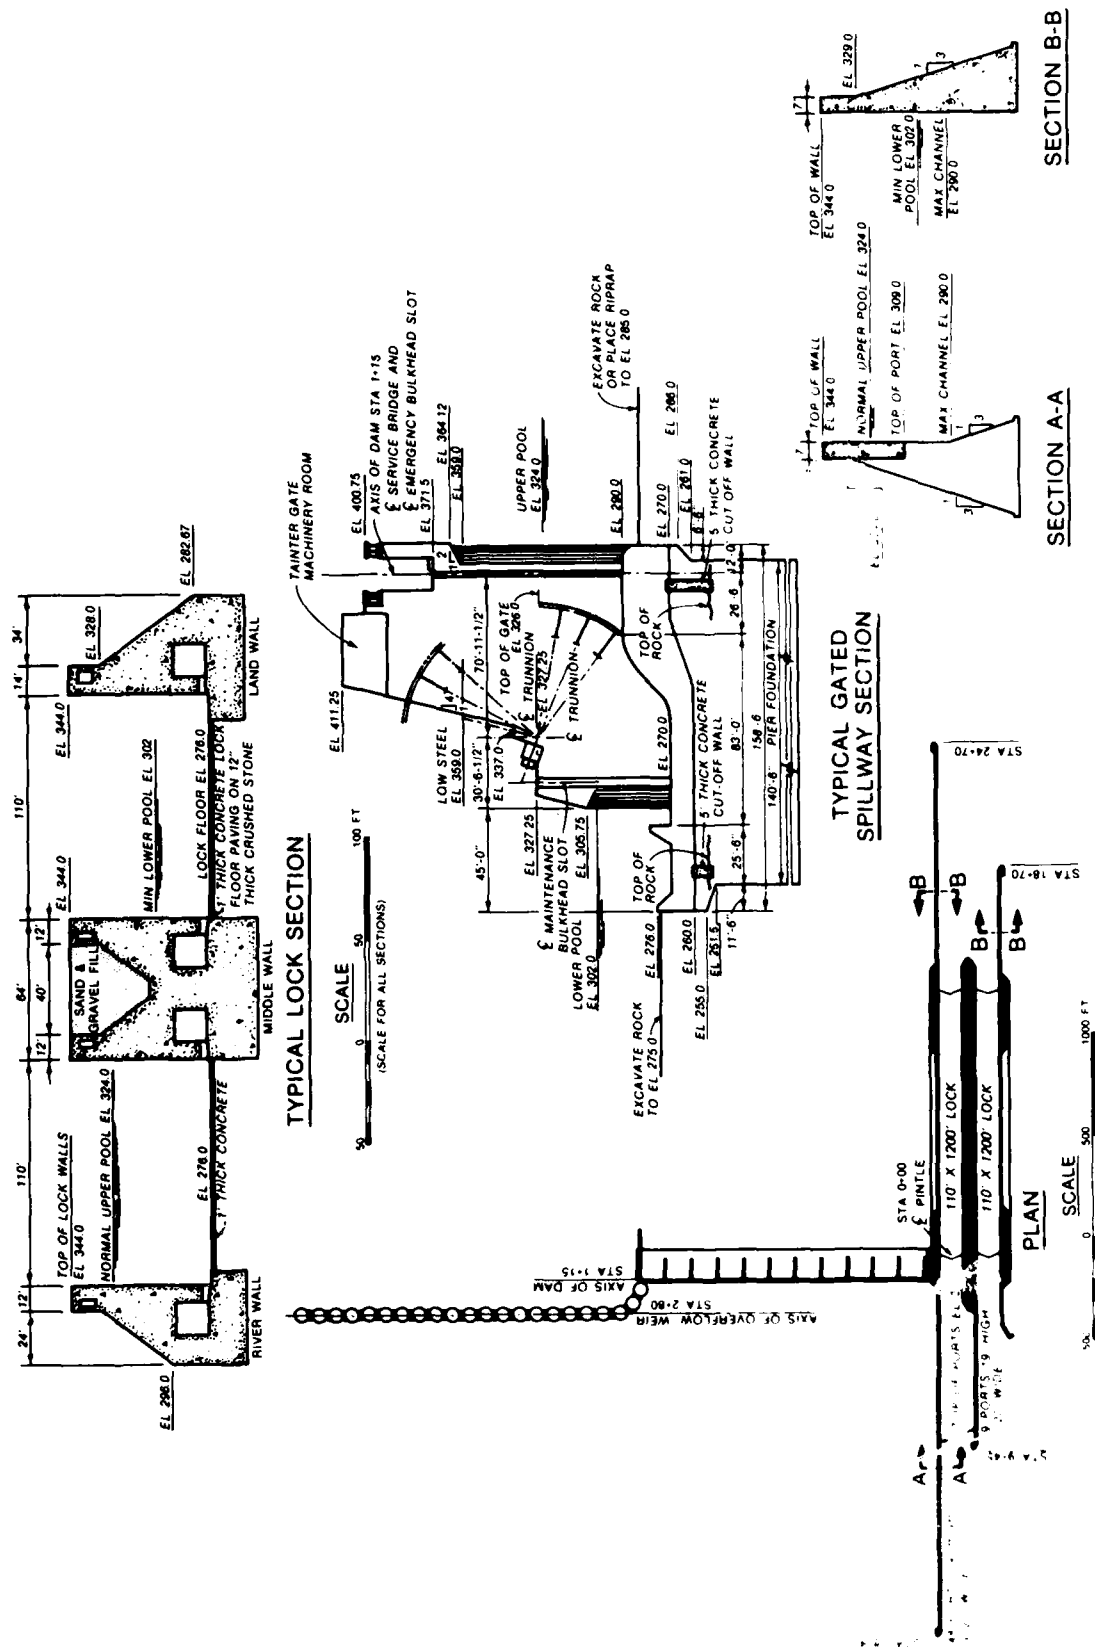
General plan and sections as originally submitted of locks and dam for 11-gate spillway
